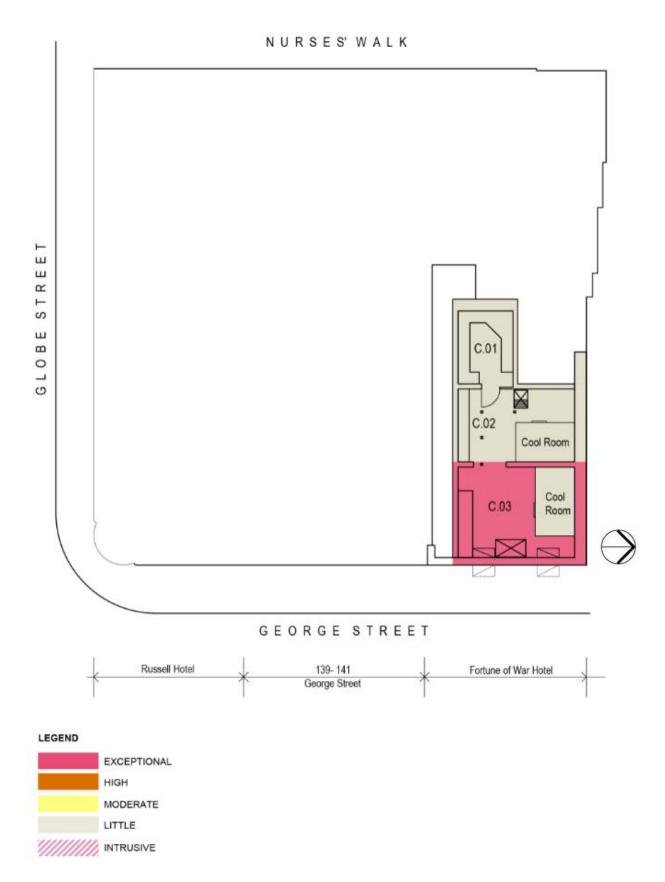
Grading of significance, cellar and upper ground gloor plan, TKD Architects (not to scale)
